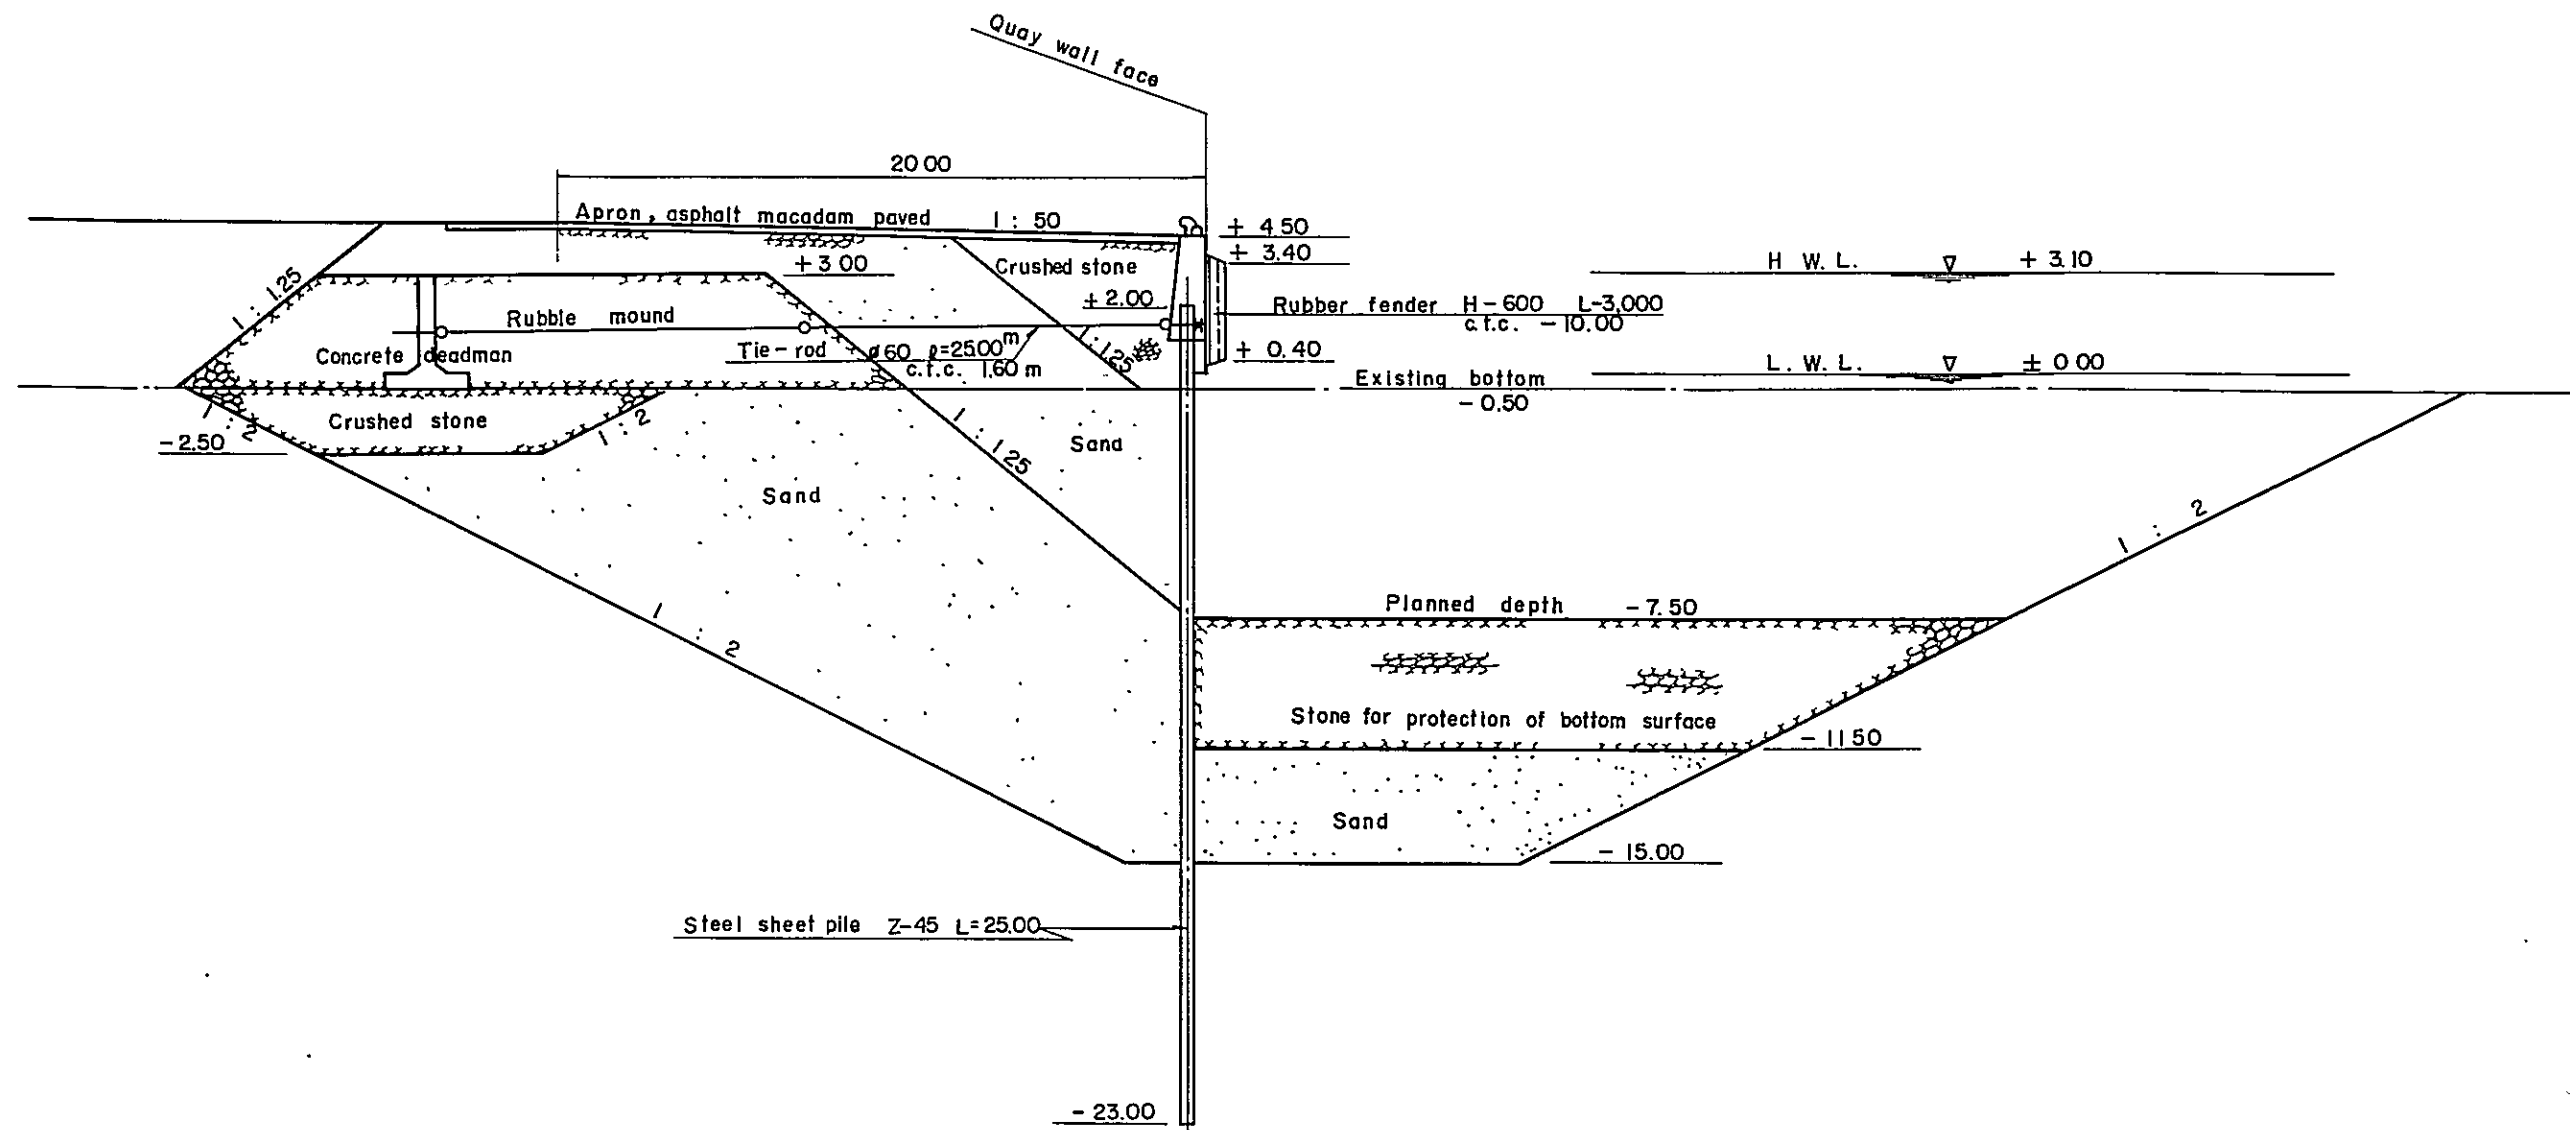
(i) STANDARD SECTION OF -6.0 M SHEET PILE QUAY WALL
